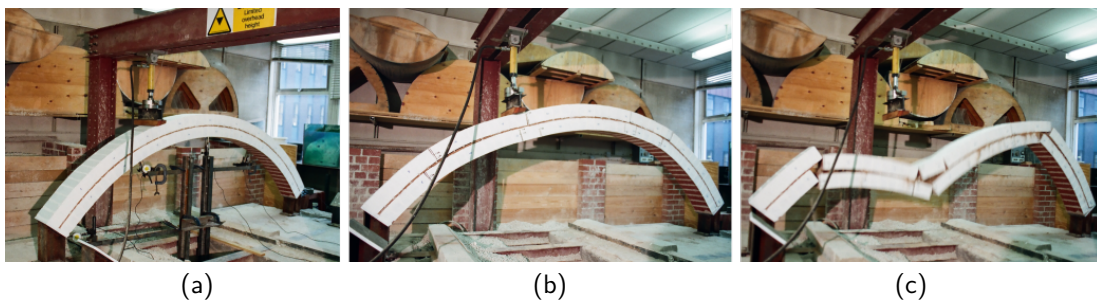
Two-ring arch - experimental testing: (a) initial setup; (b) hinges forming; (c) collapse of structure (arch has 3 m span, 0.75 m rise, 215 mm thickness and 215 mm width and is subject to point load 0.84 m from left abutment [167]).
